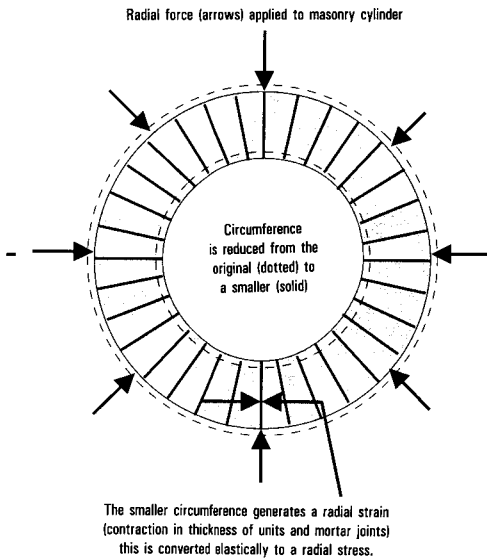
Forces on masonry cylinders, e.g. arches, tunnels and sewers.
